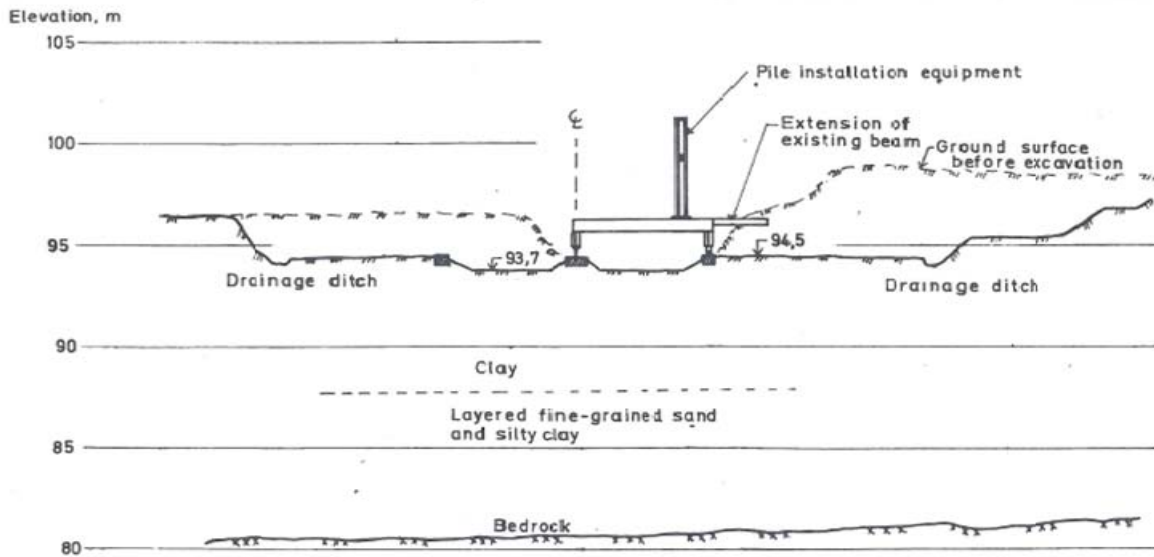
Typical cross section through the test site at Haga (from Karlsrud and Haugen, 1984)
